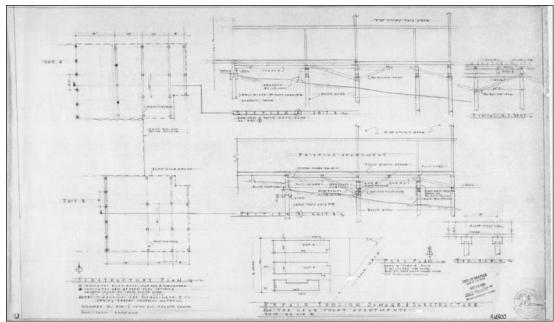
"Repair Erosion Damage & Substructure for the Lake Court Apartments 2012 43 Ave E [Building Permit] 514800"
